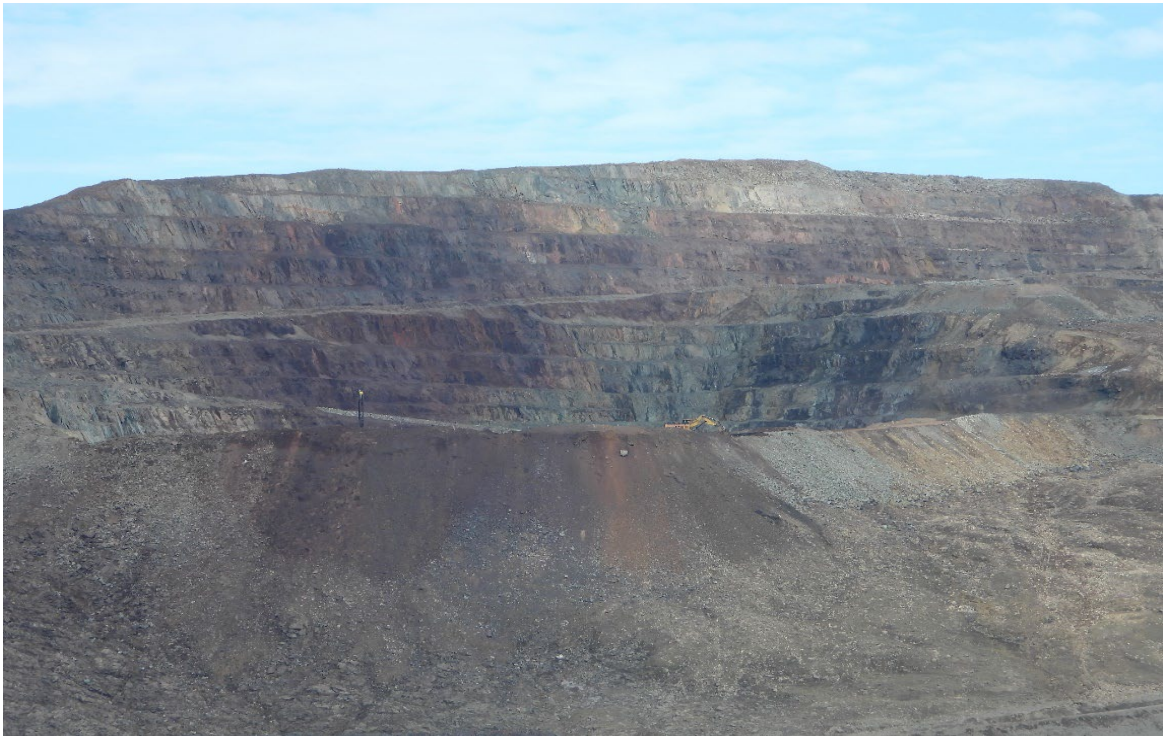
Deposit No. 1 Nuluujaak Pit Walls - June 2024
